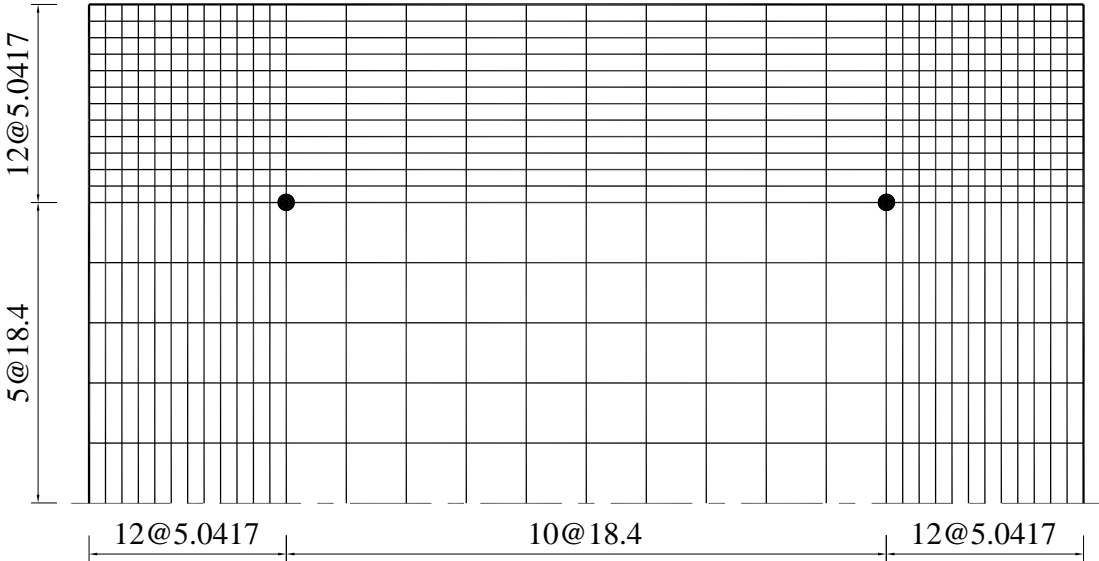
Finite element discretization of the cross section of NRC Column 1582 for structural analysis and the steel reinforcing bar location (dimensions in mm)
